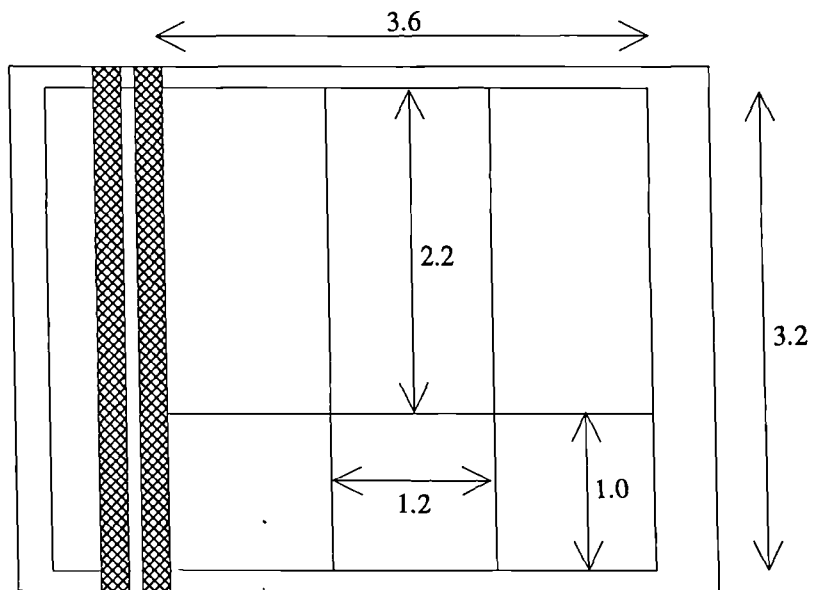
Plan of 12.5mm thick plasterboard ceiling panels.
